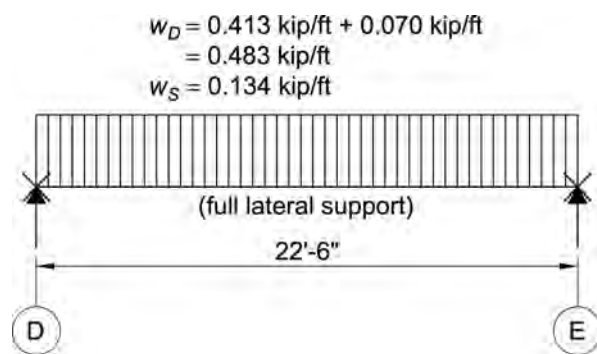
Beam loading and bracing diagram for roof beams at east and west ends of building.
